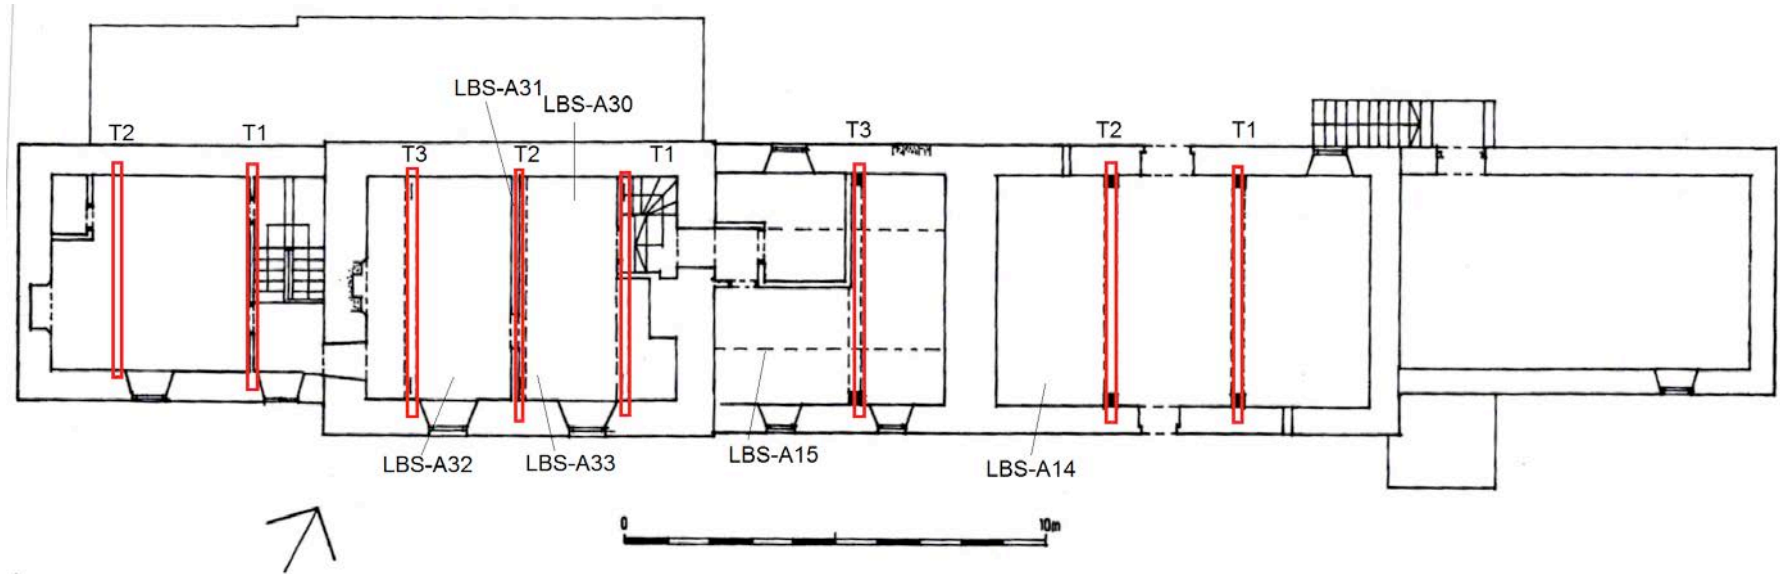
First-floor plan, showing the approximate position of sampled trusses and location of samples LBS-A14–15 and LBS-A30–33 (Martin Roberts)
